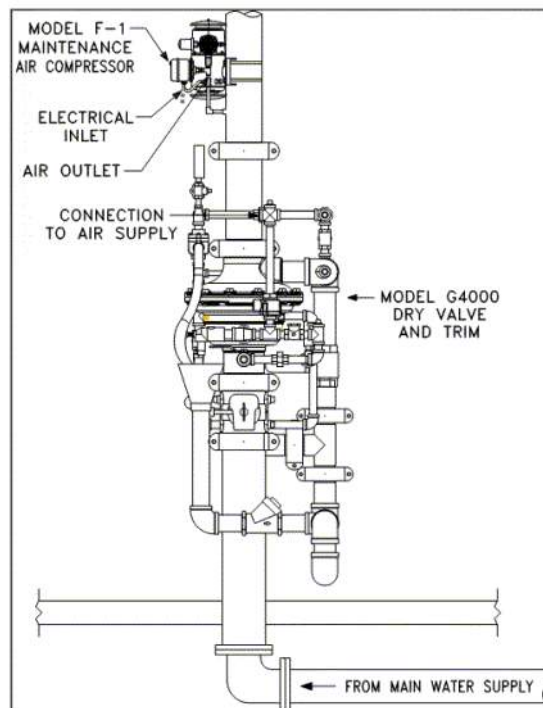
Typical Dry-Pipe Assembly with local Riser Mounted Air Compressor for Automatic Filling (Viking)
